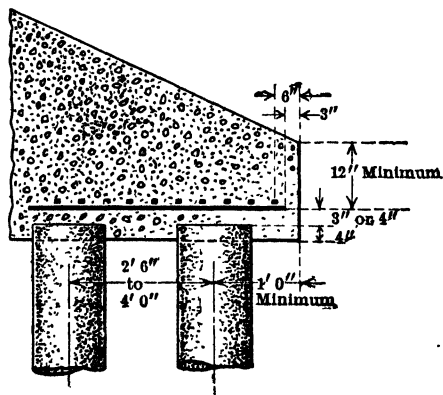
Detail of Reinforced-Concrete Footing on Concrete Piles
